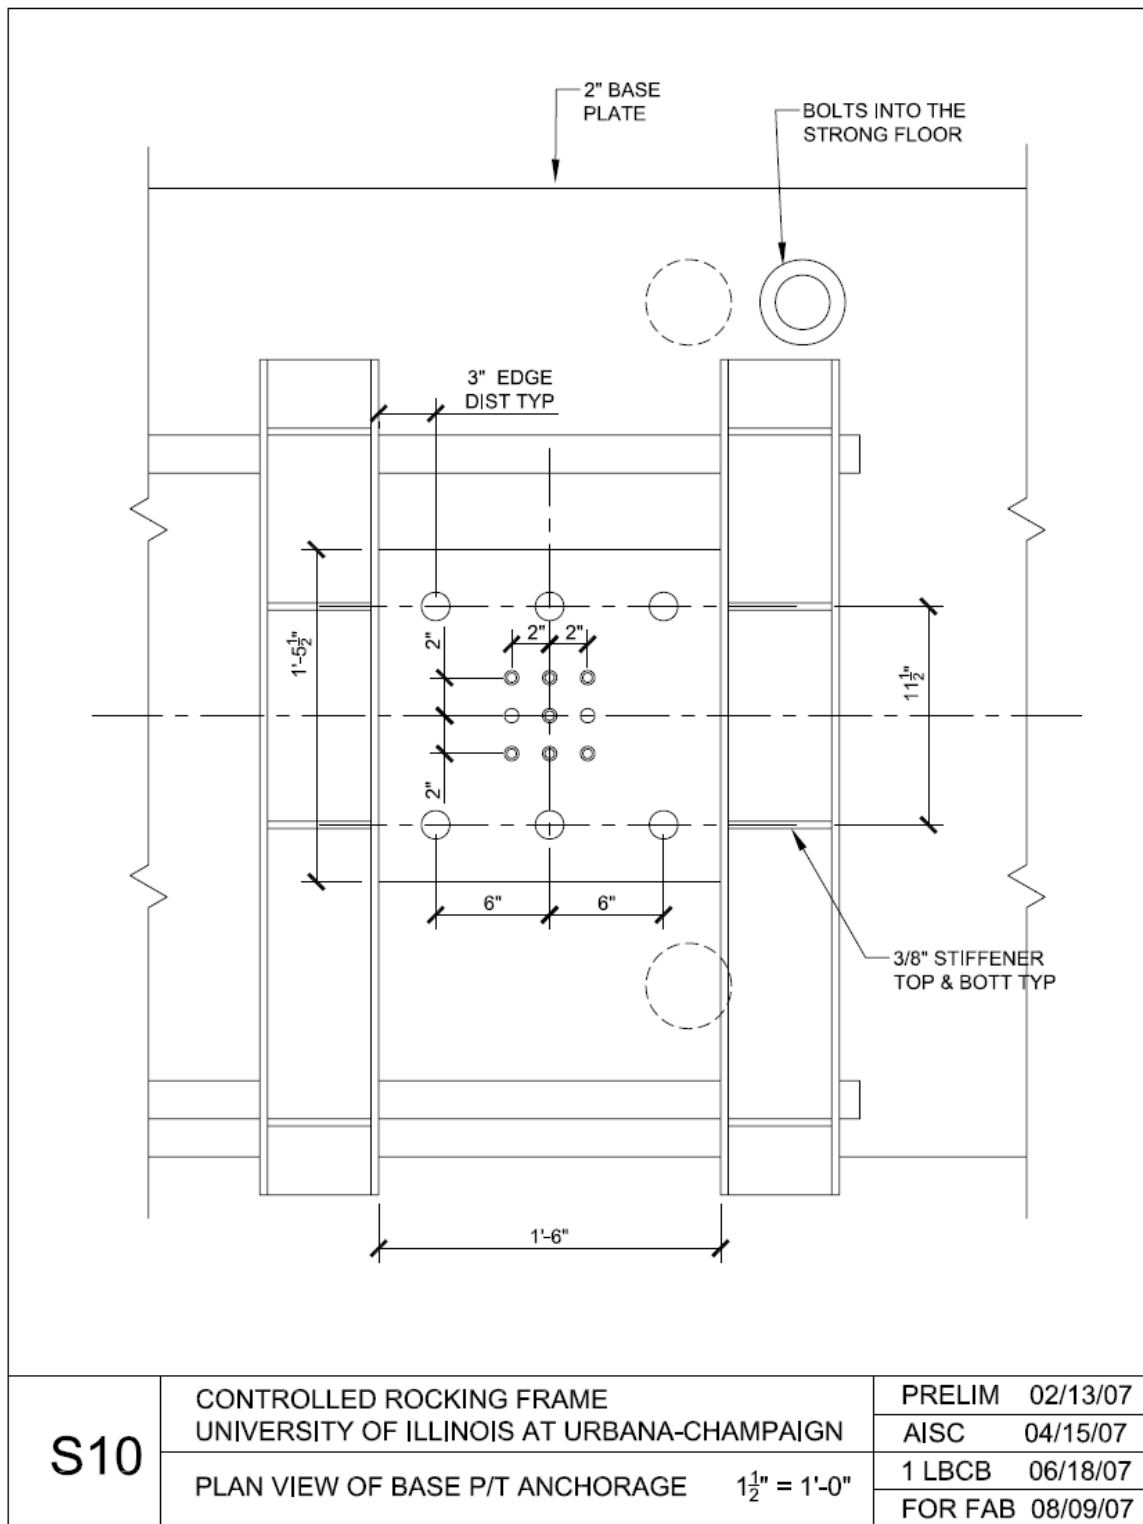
Specimen Design Drawing – Plan View of Base Post-Tensioning Anchorage
